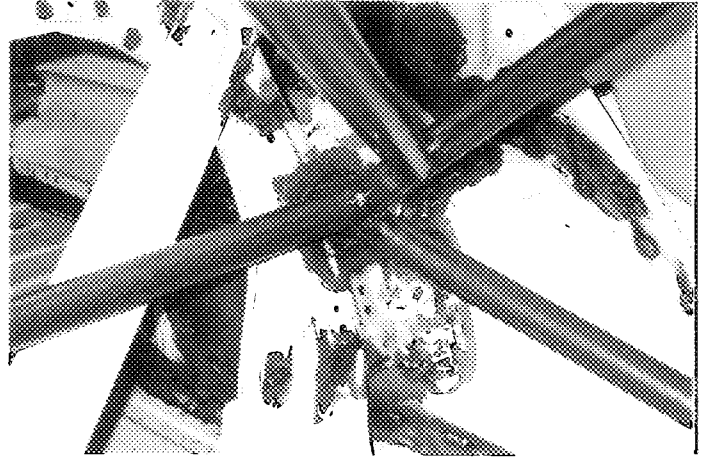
CENTRAL FRAMEWORK TO FLOOR
